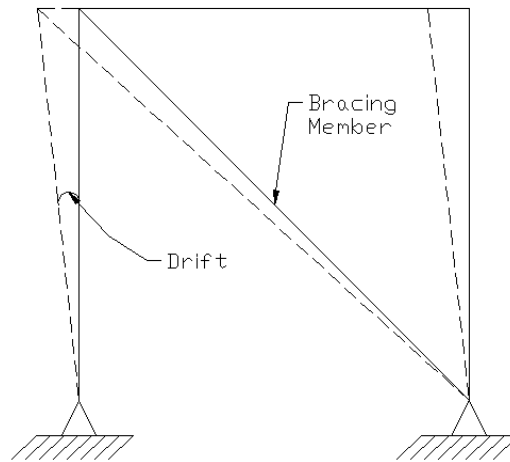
Single-Story Frame Used to Calculate the Deformation of the Bracing Member at Design Story Drift.
